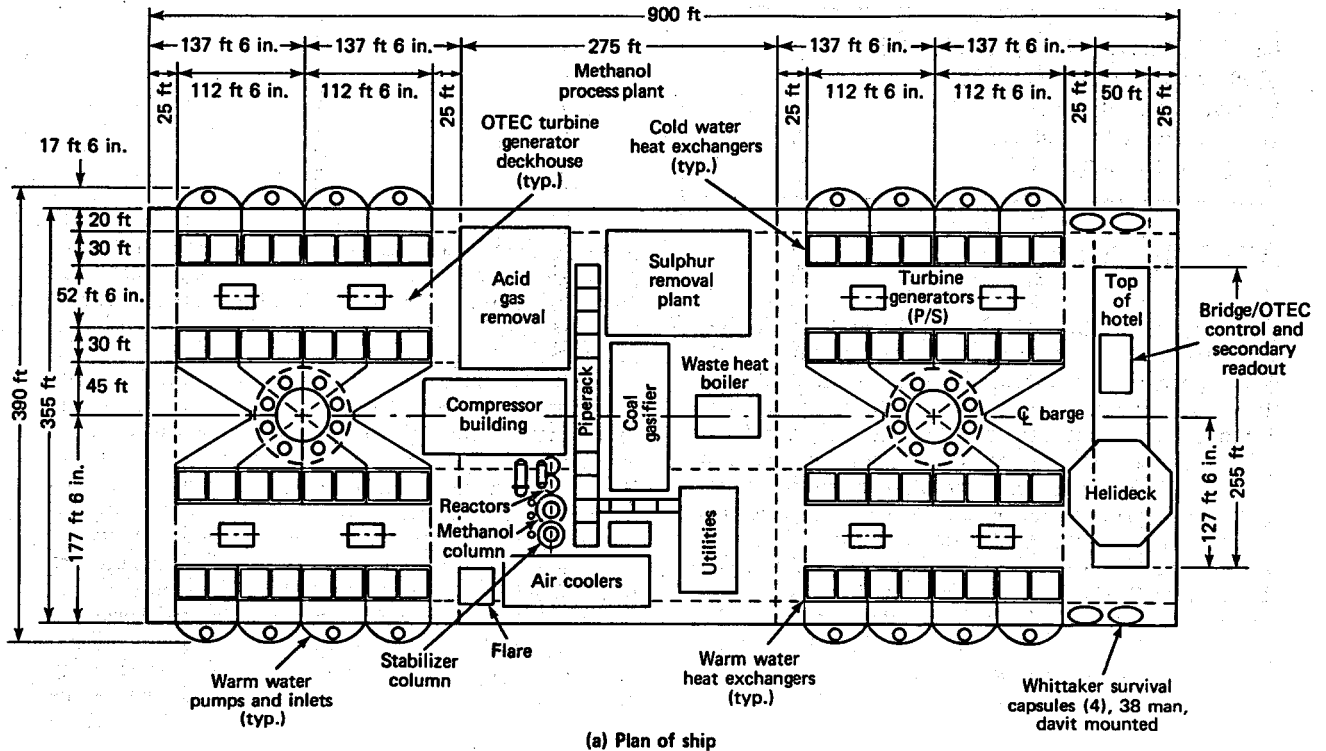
Design layout for a 160 MWe plantship. (82-3/92)
